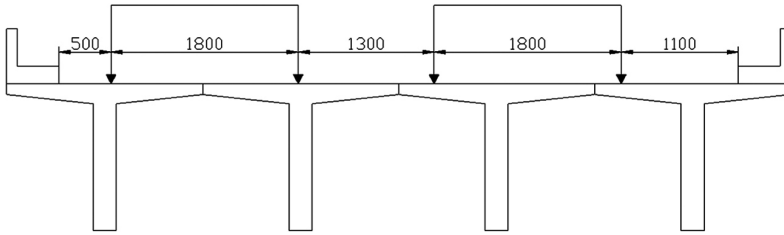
Diagram of transverse offset load vehicle arrangement (unit: mm)
